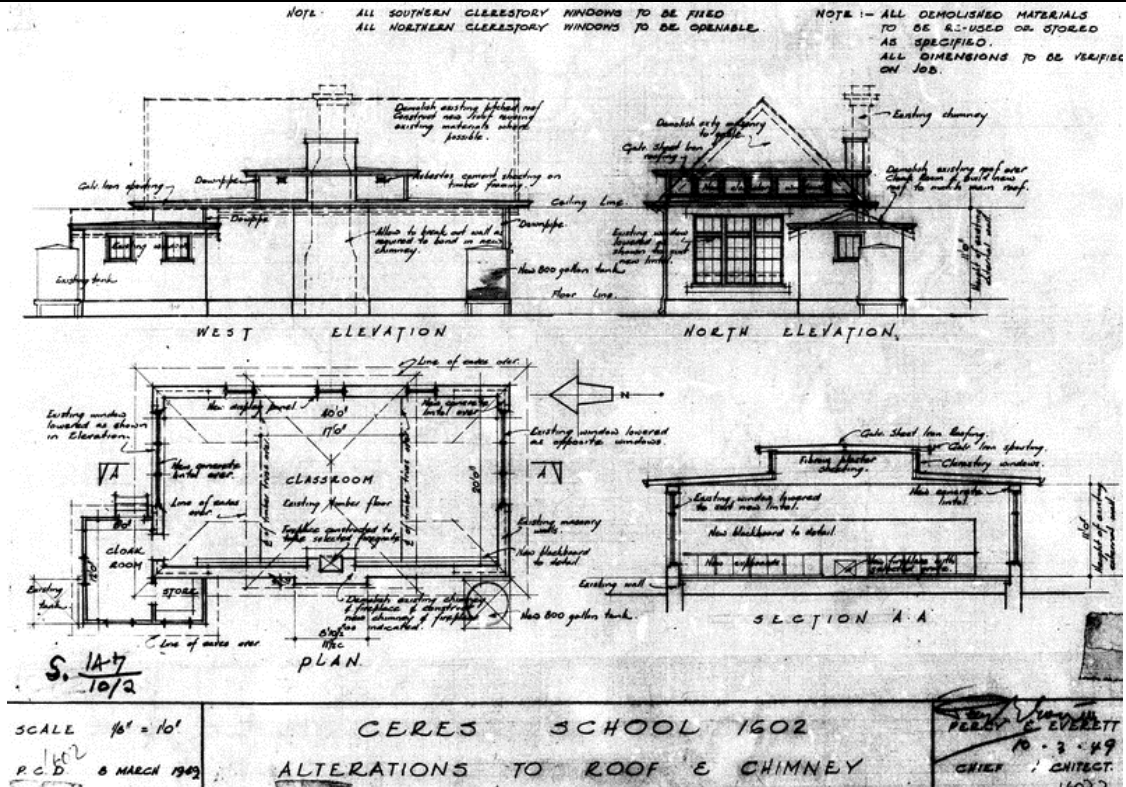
P. Everett, Proposed Alterations to Ceres School – Floor Plan, Elevations & Section, 10 March 1949, Source: Drawing SSN 1602.2, Public Record Office Victoria.
